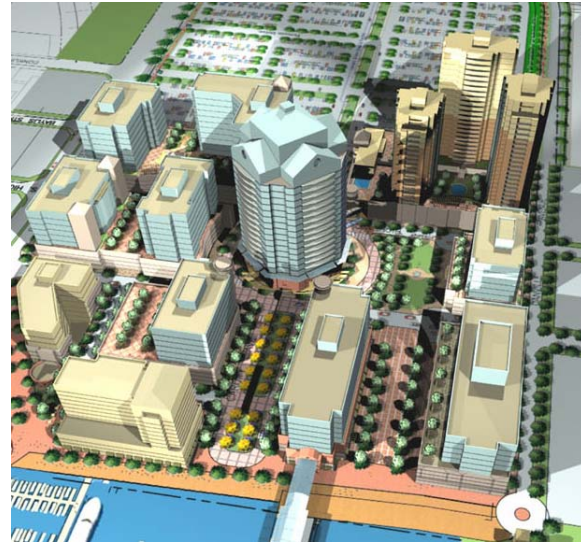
3D aerial of the Planned Unit Development (PUD)
